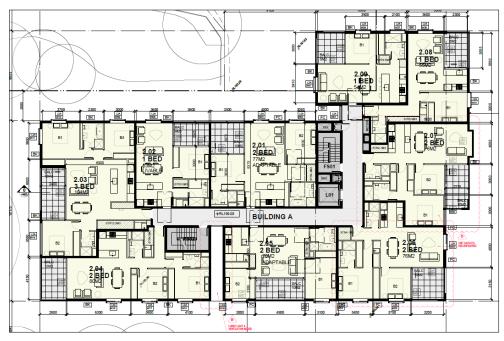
Typical floor plate for Level 1-3 where 9 units are proposed per floor
